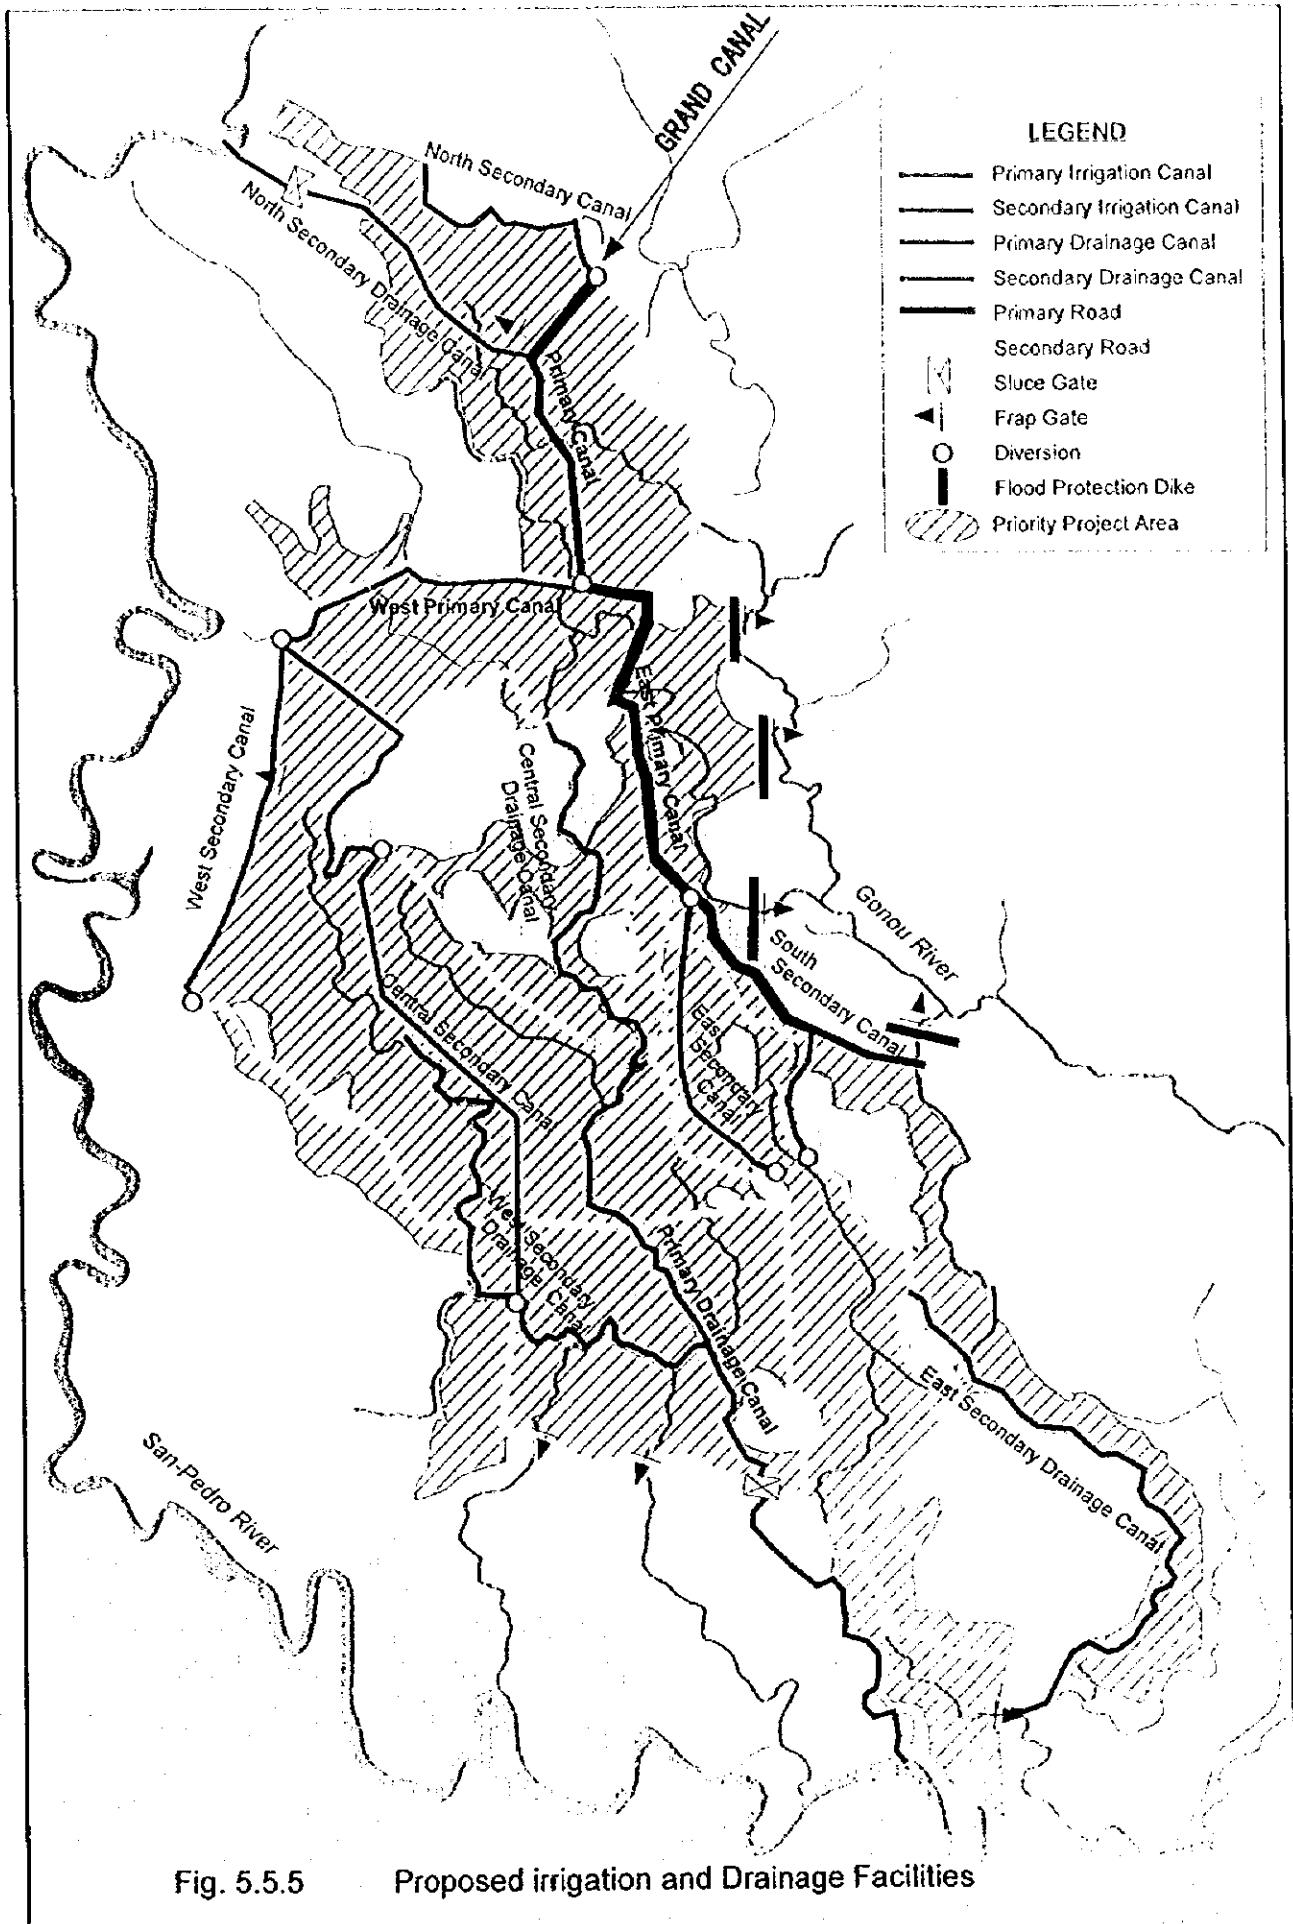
Proposed irrigation and Drainage Facilities
